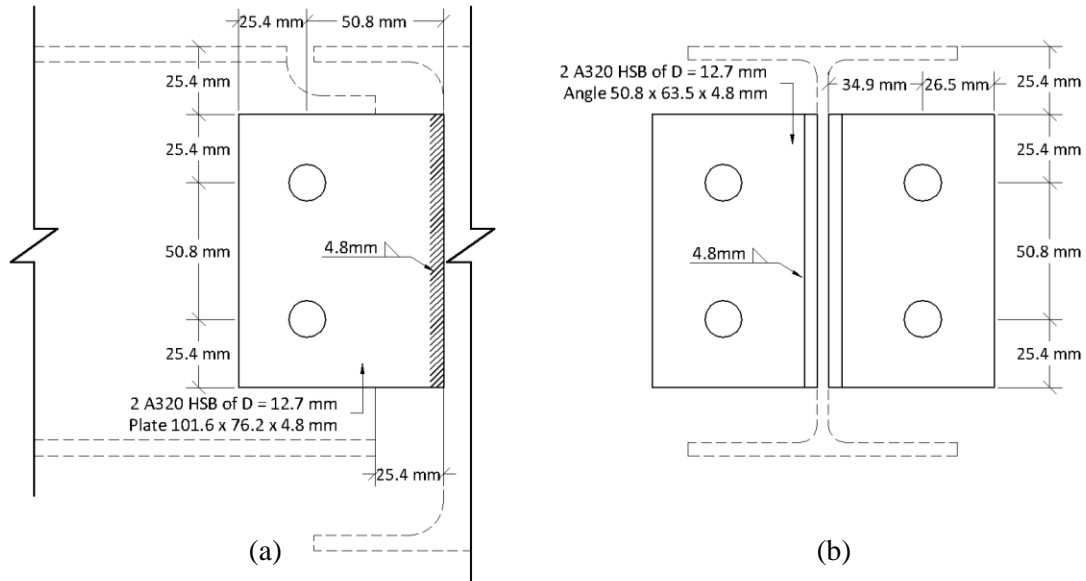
Connections used in the test specimens: (a) Single-plate shear connection, (b) Double-angle shear connection
